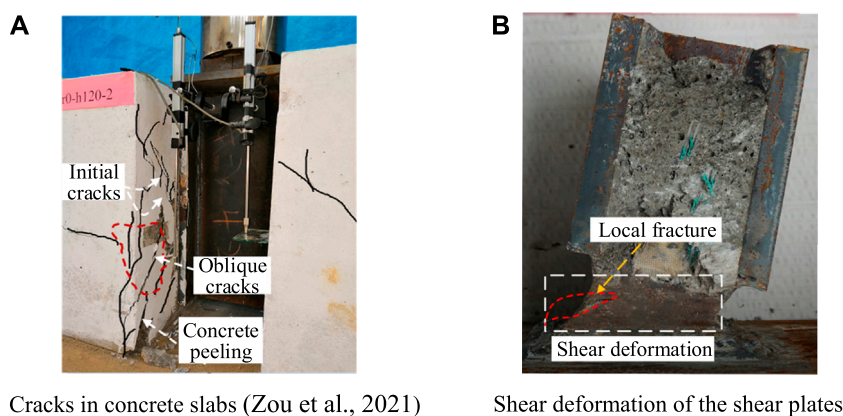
Failure modes of push-out test specimen (BS-r20-h120). (A) Cracks in concrete slabs (Zou et al., 2021) (B) Shear deformation of the shear plates.
